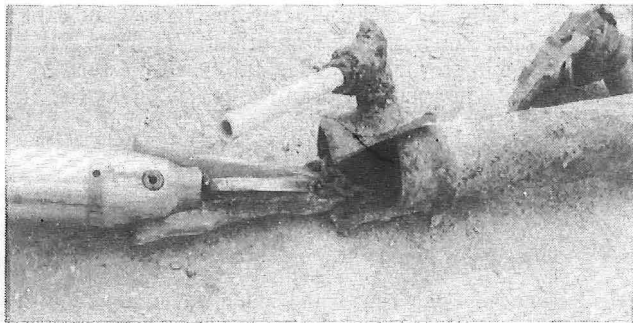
Pipe burster unit on left, and cast-iron pipe and fractured coupling
